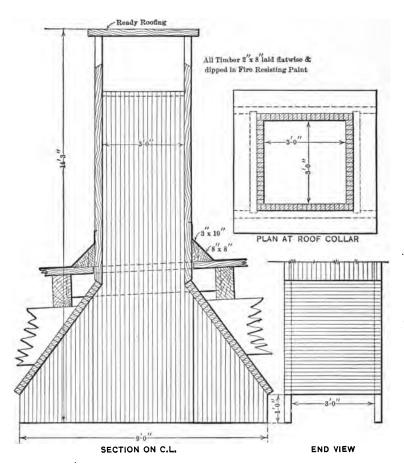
Wood Mill Type Smoke Jack, C. P. R. Standard.
